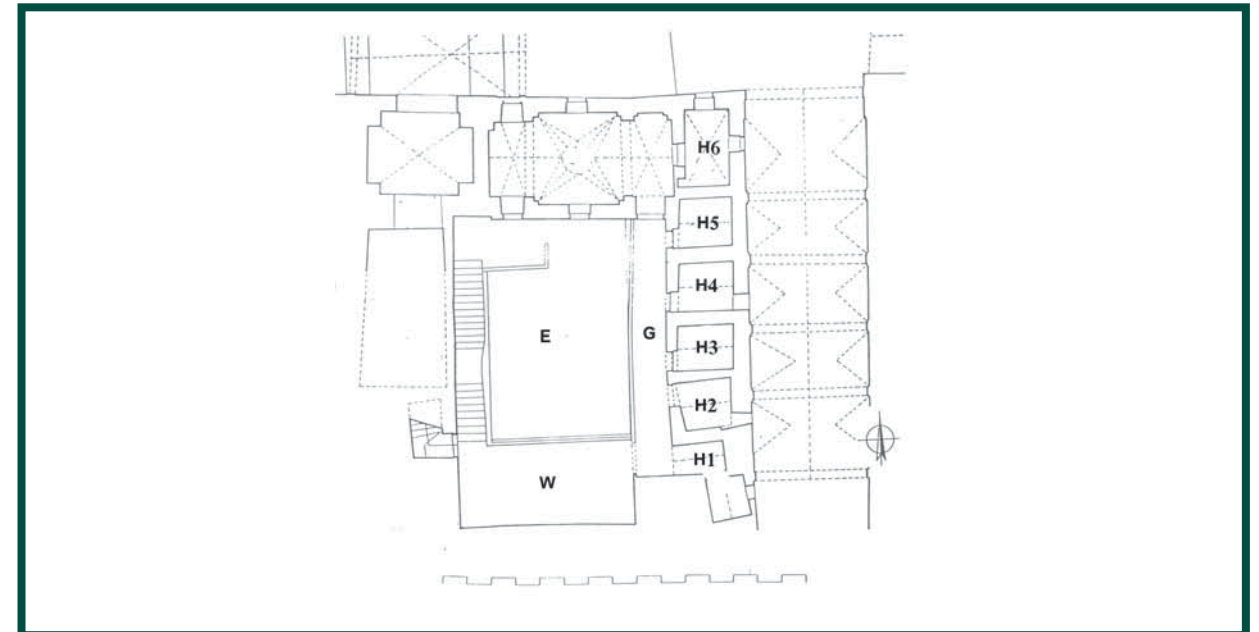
Plan of first floor of Ribat Bairam Jawish
